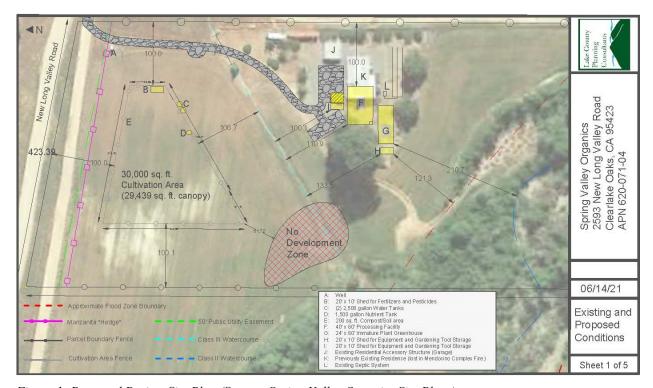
Proposed Project Site Plan (Source: Spring Valley Organics Site Plans)
